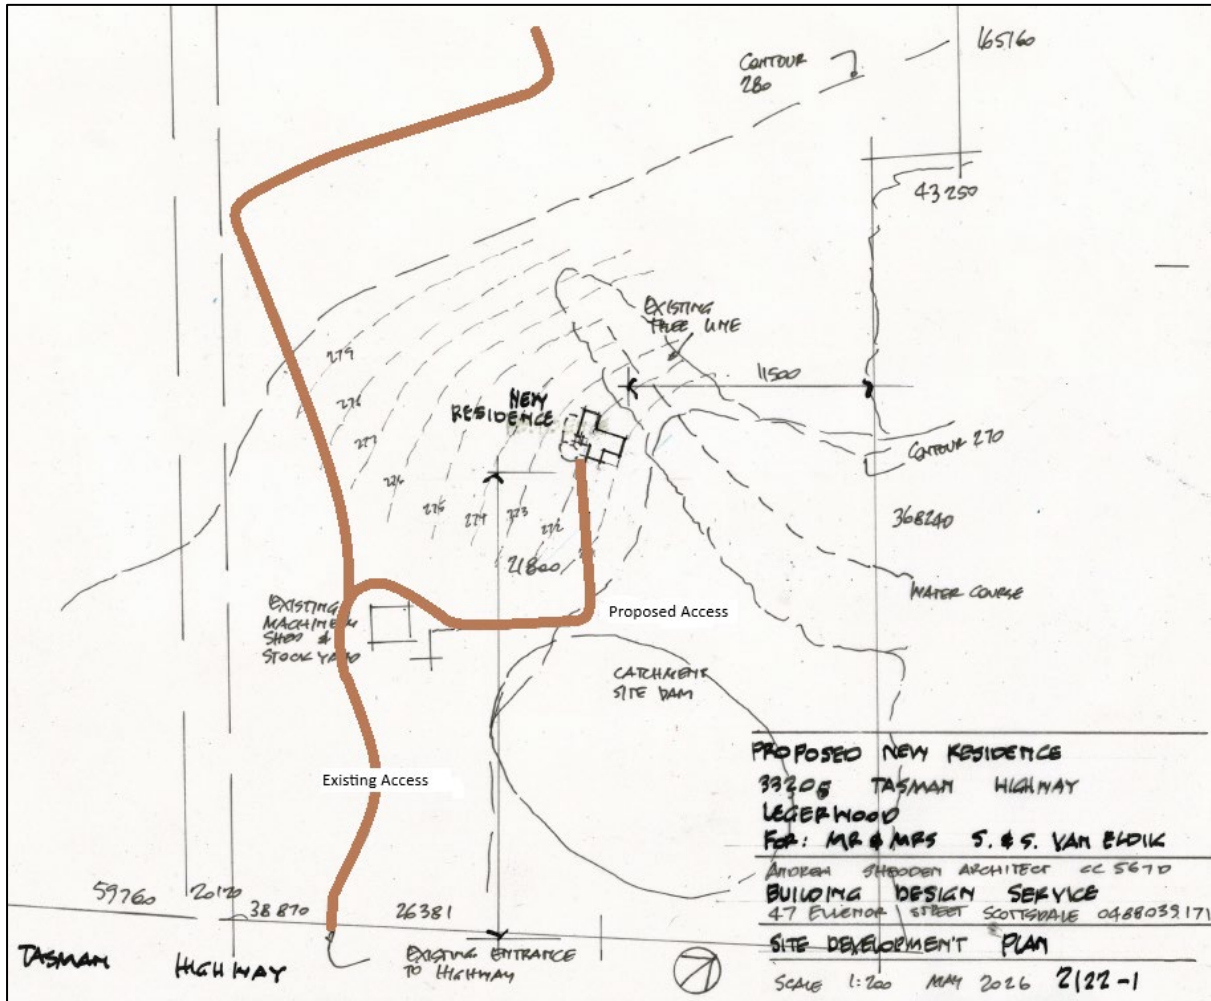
Farm dwelling siting, including access and driveway configuration (adapted from Building Design Service).
